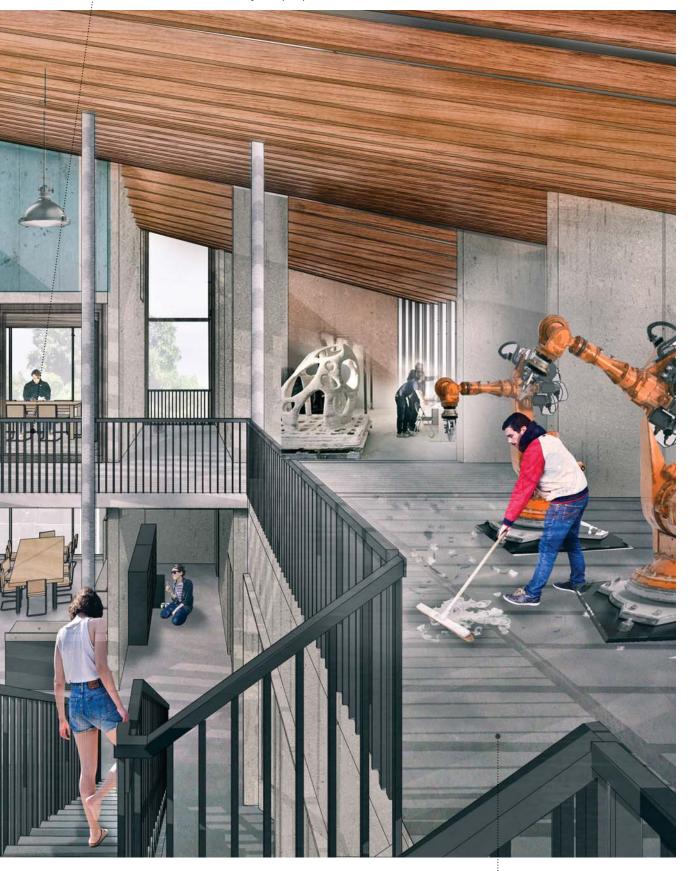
// Interior view from Level 2 looking towards Meeting Room space with Break Space elow.
